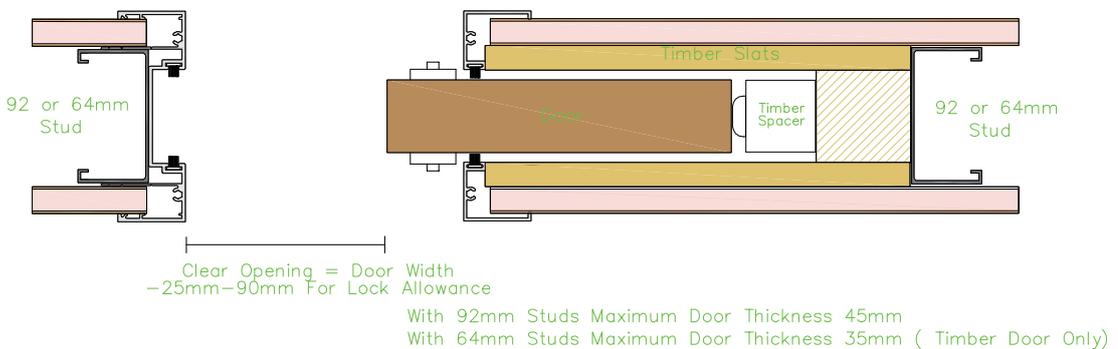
| Metinno Aluminium Overall Standard Opening Between Studs
